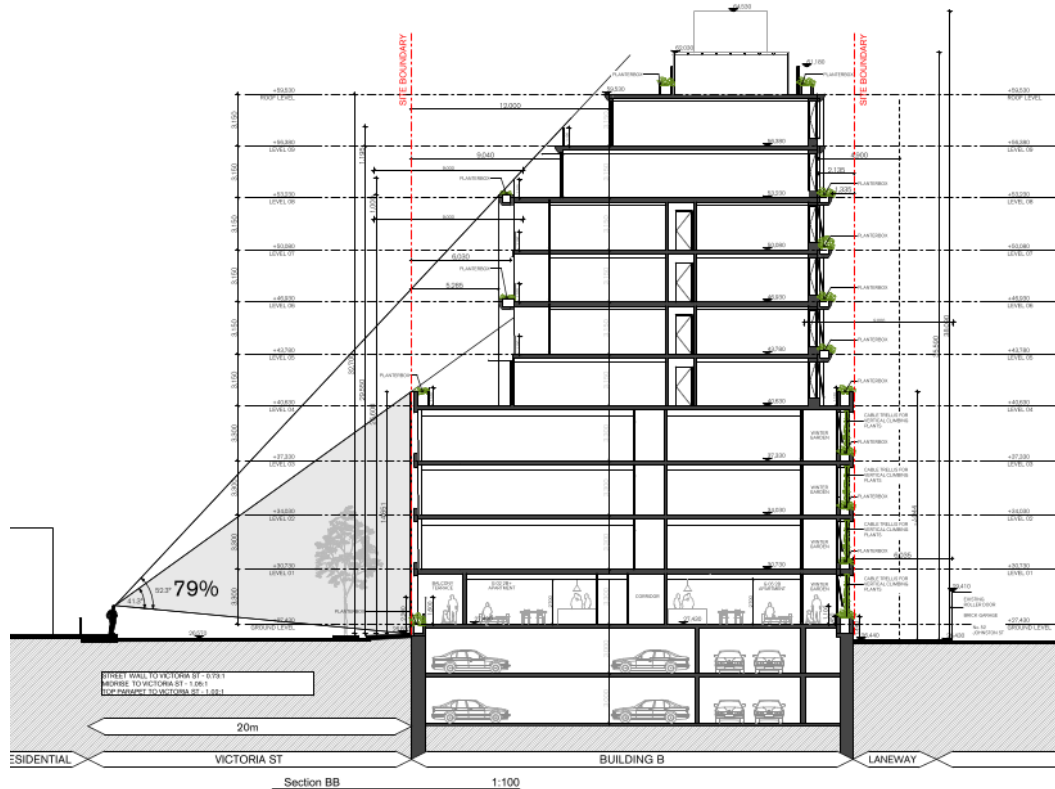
Proposed cross section showing setbacks to Victoria Street and laneway to the rear (Applicant submission)
